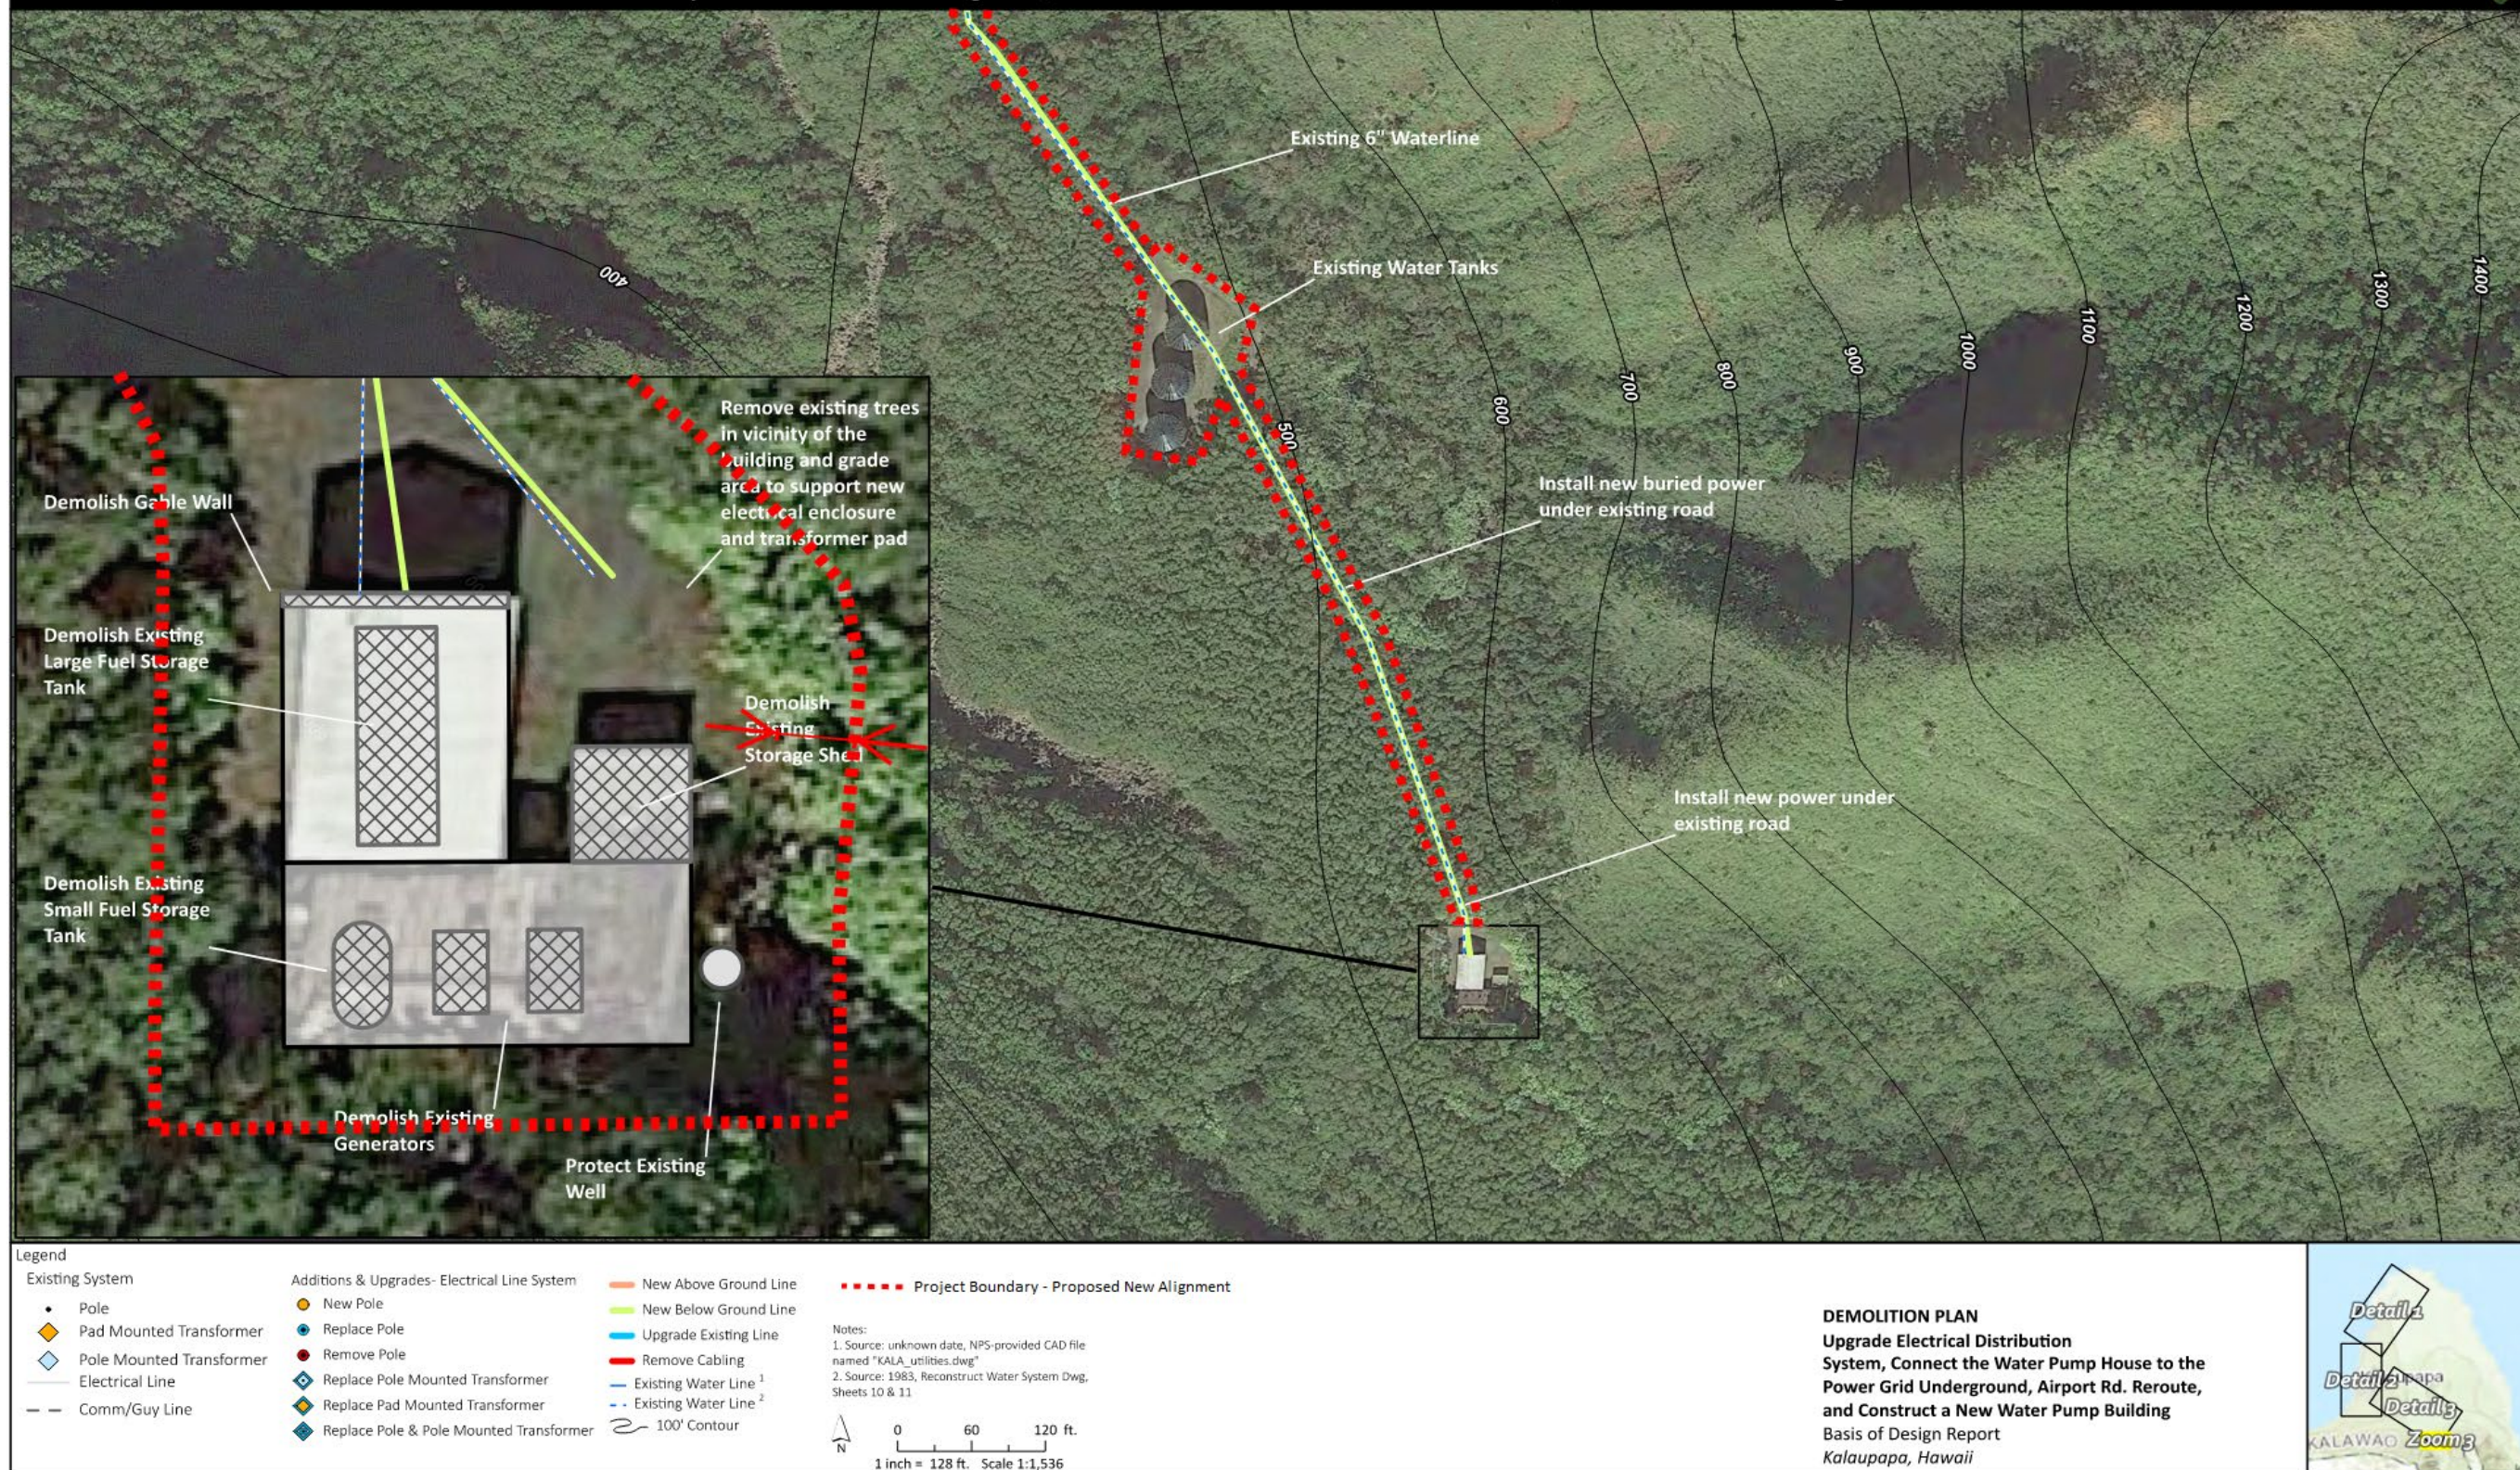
ALTERNATIVE 2 WATER PUMP HOUSE GENERATOR AND AUXILIARY EQUIPMENT DEMOLITION (OPTION 3 SHOWN)
